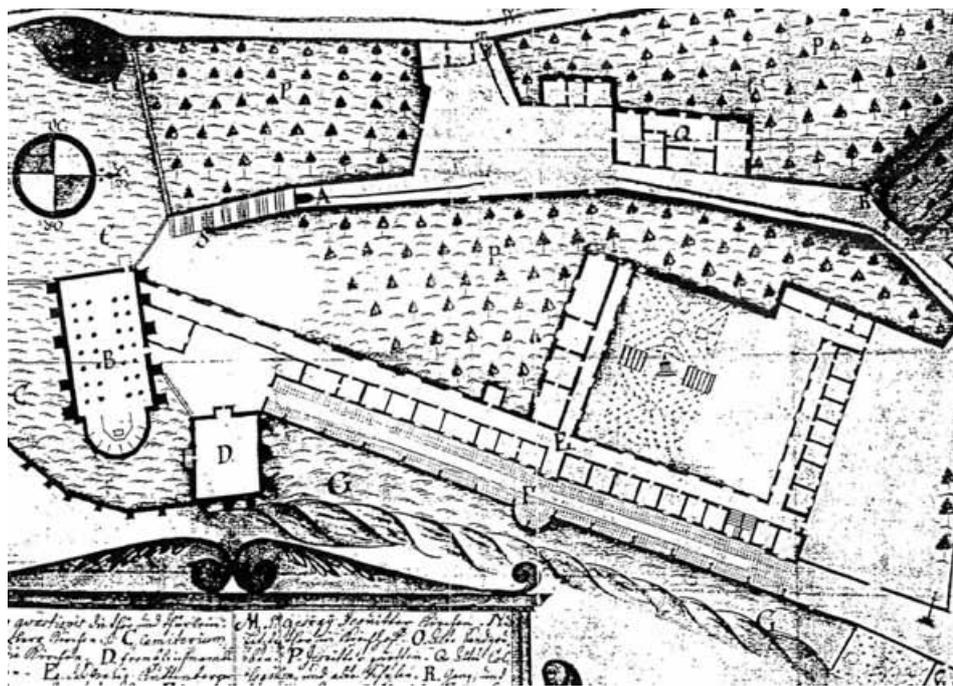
Kutná Hora, Jesuit College. Plan dating from 1732. The plan shows the college to the same structural extent as survives today (with the exception of the passage linking it to the Cathedral of Saint Barbara). On the west side of the lower courtyard stands building B and a park is also shown. The upper plateau is crossed by an older lane, by which a temporary college building stands (Q). The plan generally corresponds to facts ascertained, but has been slightly schematised.
